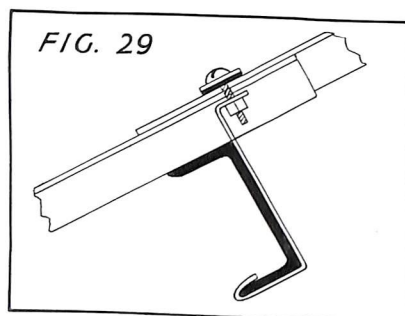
$\frac{1}{4}$ " Galvanised Short Bolts and Clips for fixing to channel iron purlins.
